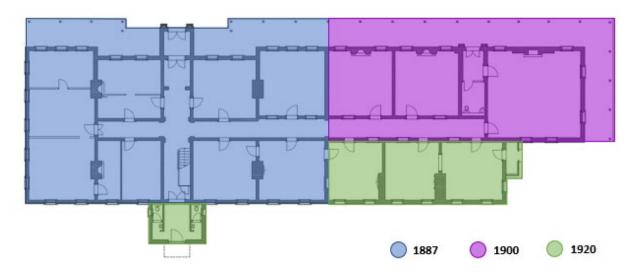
Ground floor plan of the CME Building showing the three main phases of construction.
